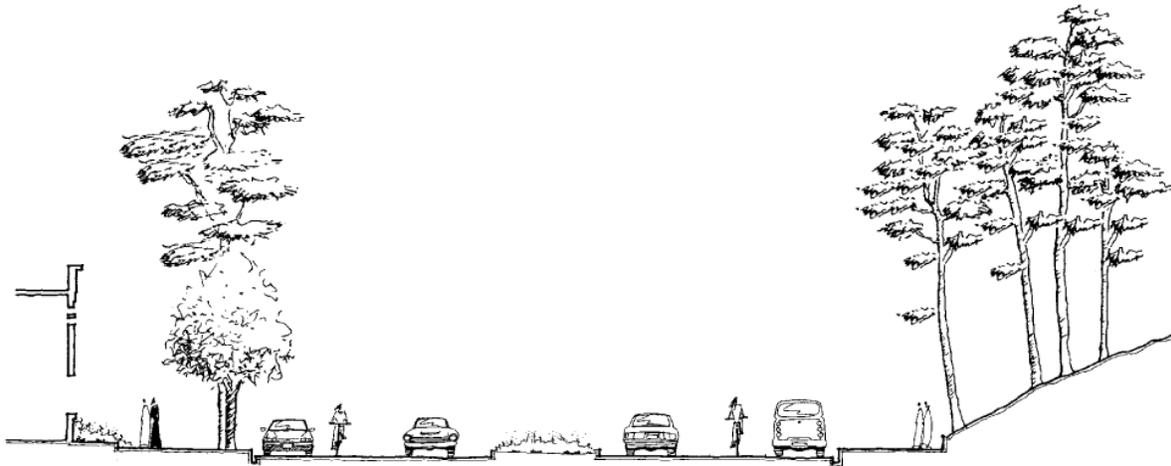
Section of Main Street at Veteran’s Memorial Hall
